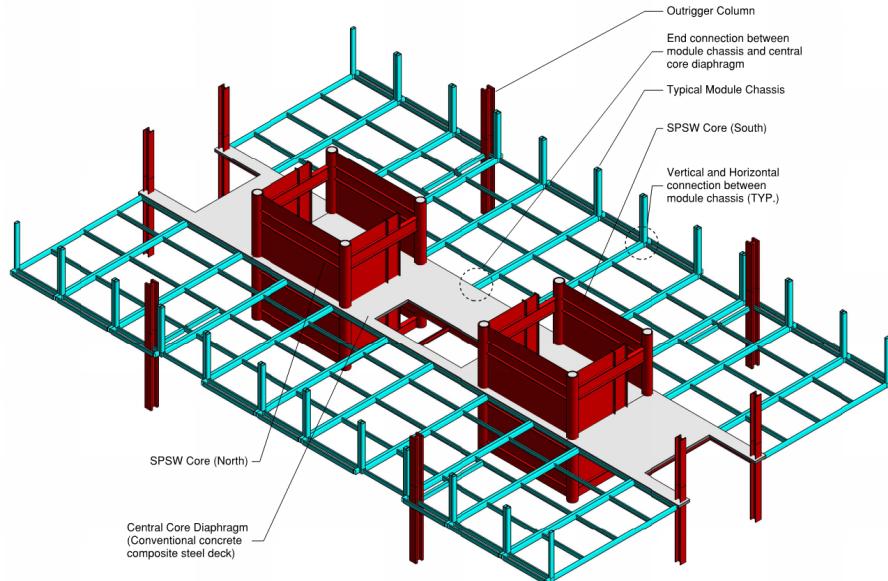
Typical Floor Framing (Volumetric Construction) © RAD Urban
